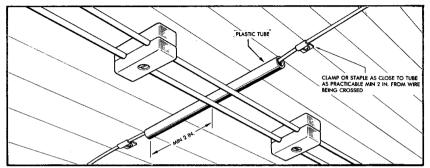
Station Wire Crossing Open Electric Light Wires (Drawing 1 of 2)
